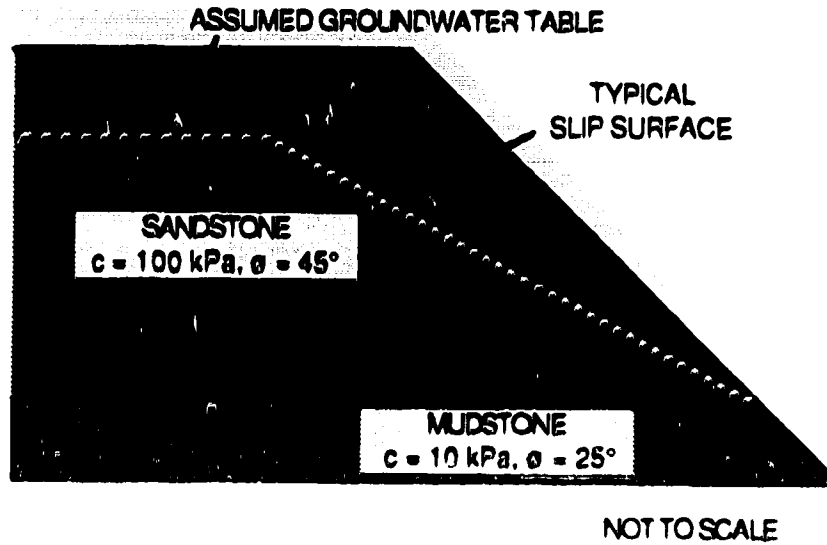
Section used by Wade and Peterson (adapted 1986) to evaluate stability of highwall in Pit 03.
